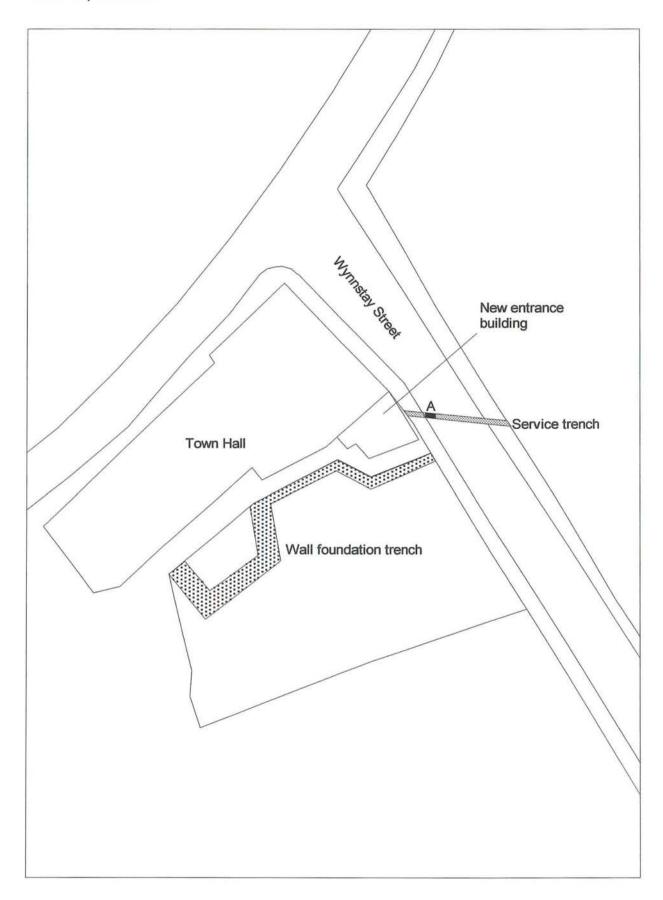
Overall plan of wall foundation trenches. Scale 1:500
